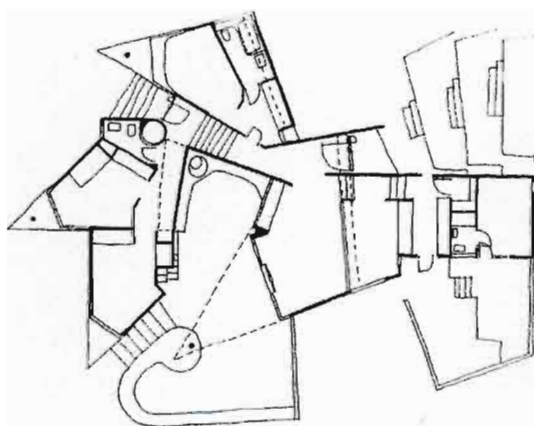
BDG – House Zietkiewicz (1975). Plan.
